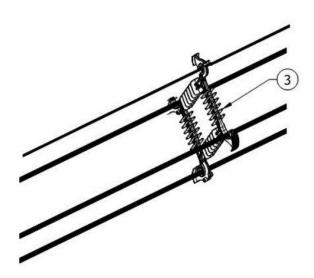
TYPICAL MID-SPAN CONFIGURATION SLOPE LESS THAN 20 DEGREES (S663280)
